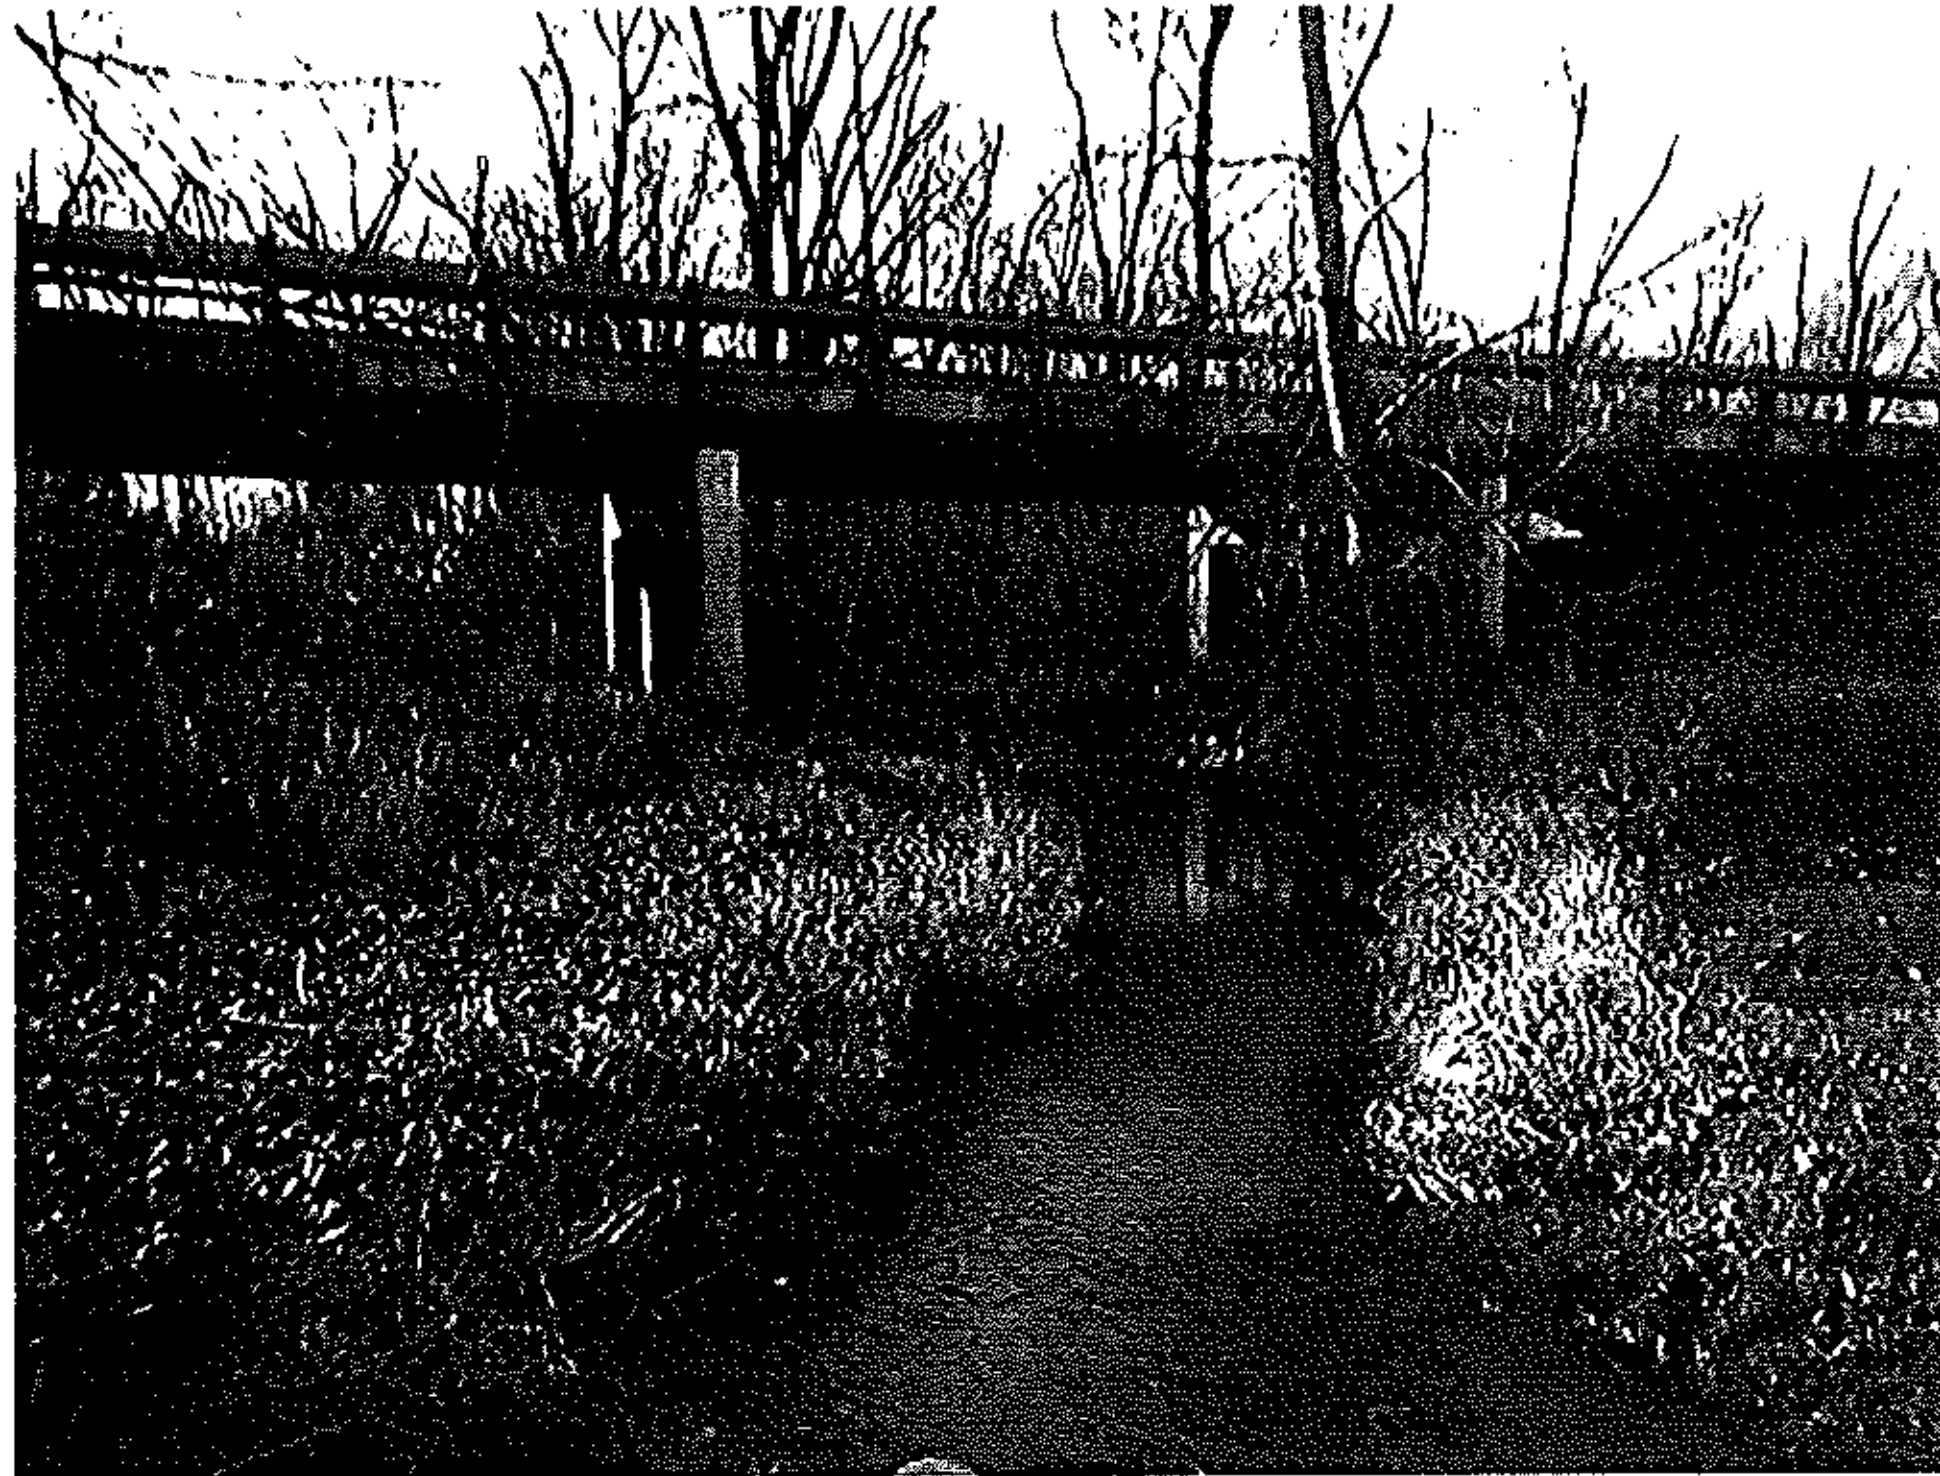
View of the SR 204 (Blacklick-Eastern Road) Bridge for FAI-SR204-4.32, looking west from the underside of the bridge.
